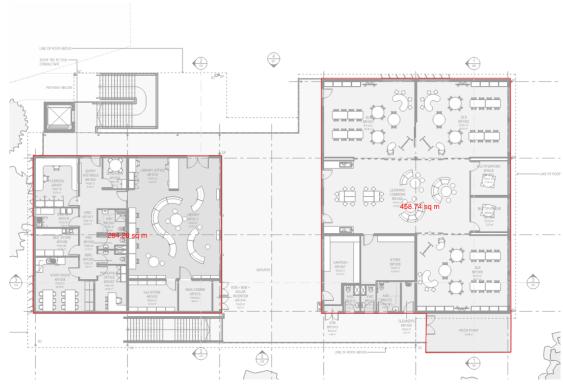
Floor area of classrooms and staff rooms – 743.82 m²
